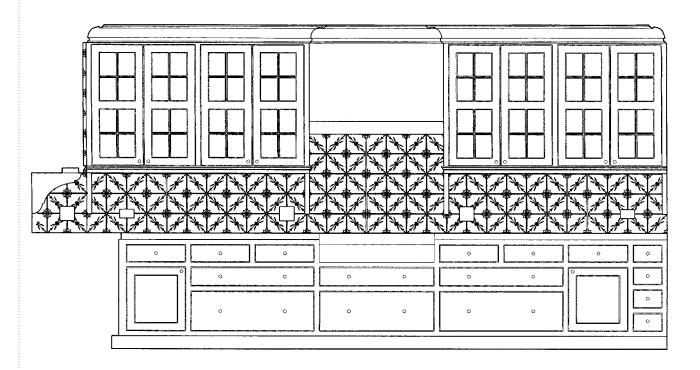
Kitchen Tile Layout (Cohen & Hacker Architects).
